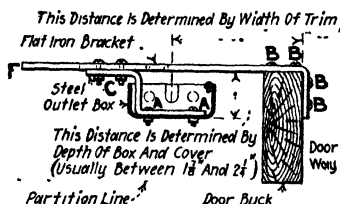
Showing bracket used for supporting switch outlet boxes for hollow-tile partition construction.
